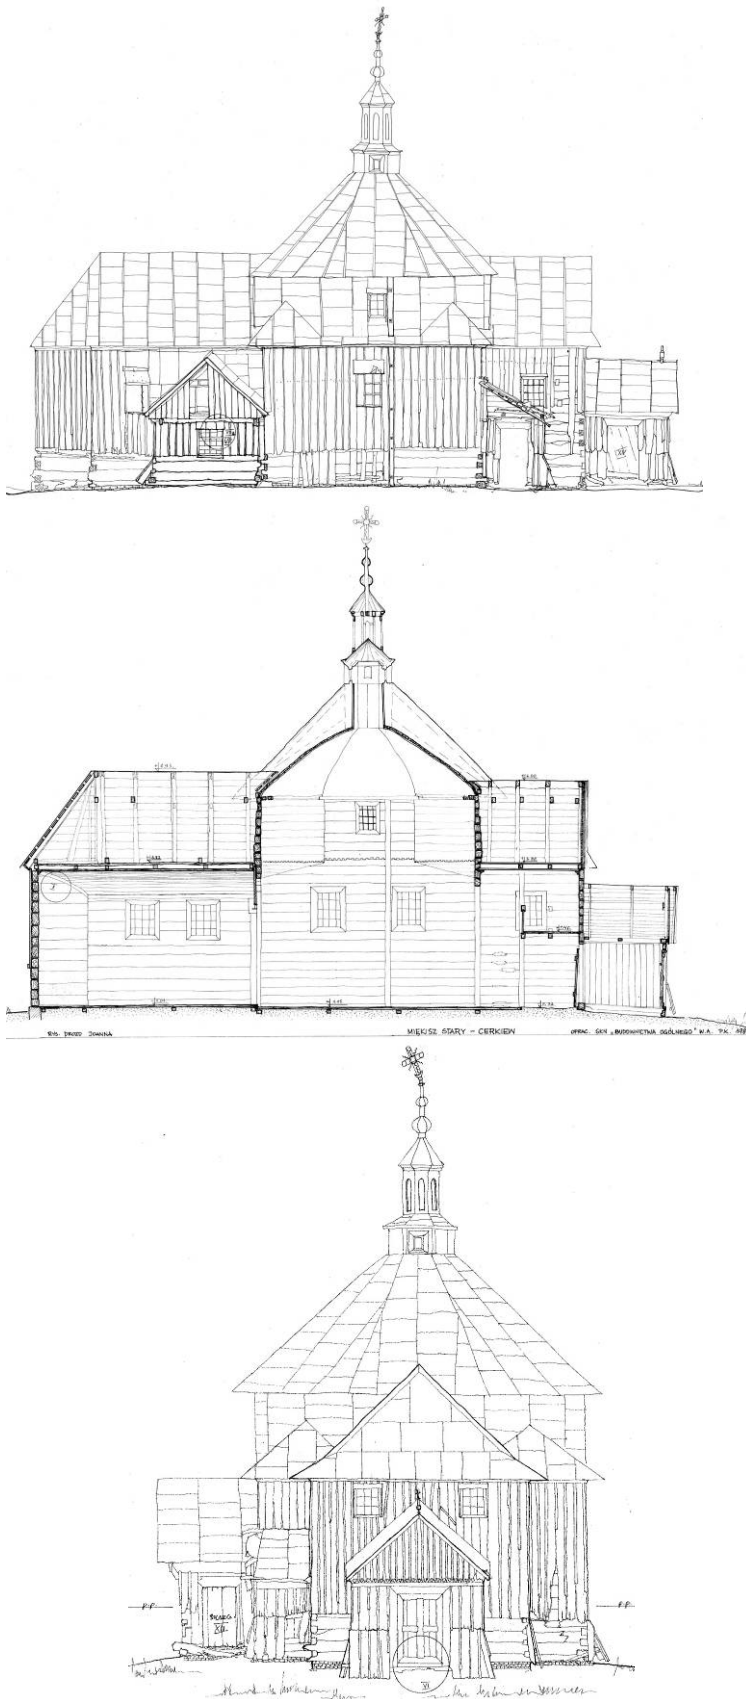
Orthodox church in Mięksisz Stary, Laszki commune - inventory drawings made by architecture students of the Cracow University of Technology under the direction of the author: north elevation Source: il. – J.Sikora / przekrój podłużny, elewacja zachodnia – J.Drozd
